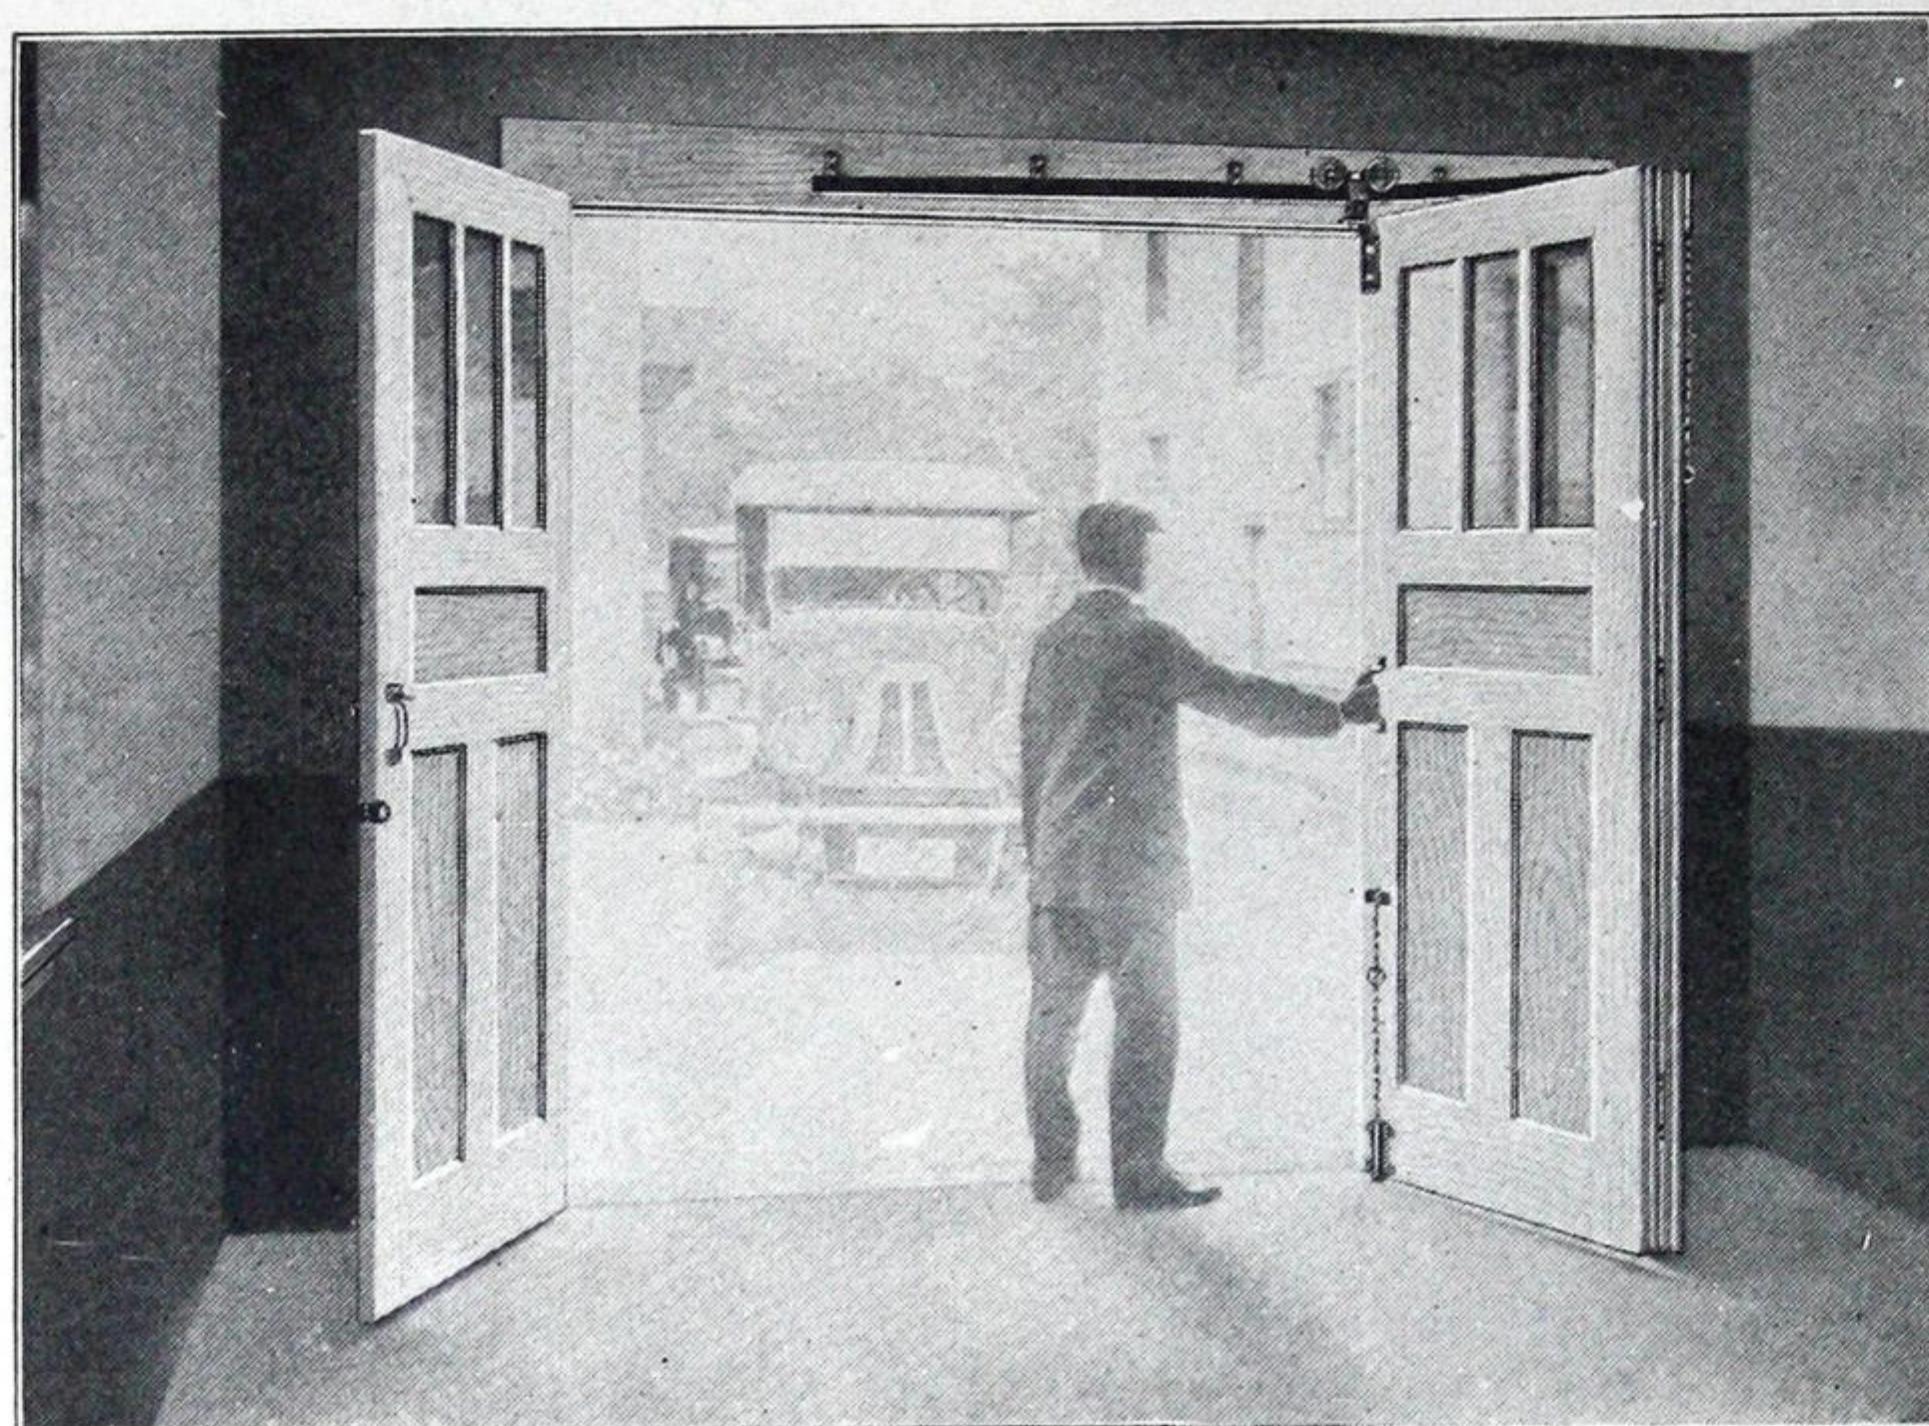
Doorway Equipped with No. 436 Fixtures
